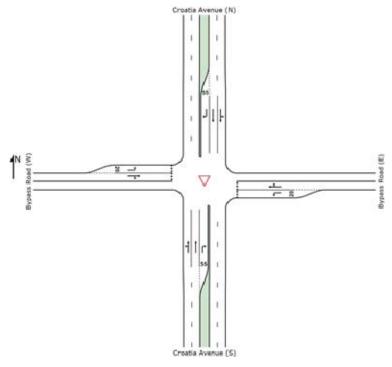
2036 Croatia Avenue/ Bypass Road Layout
